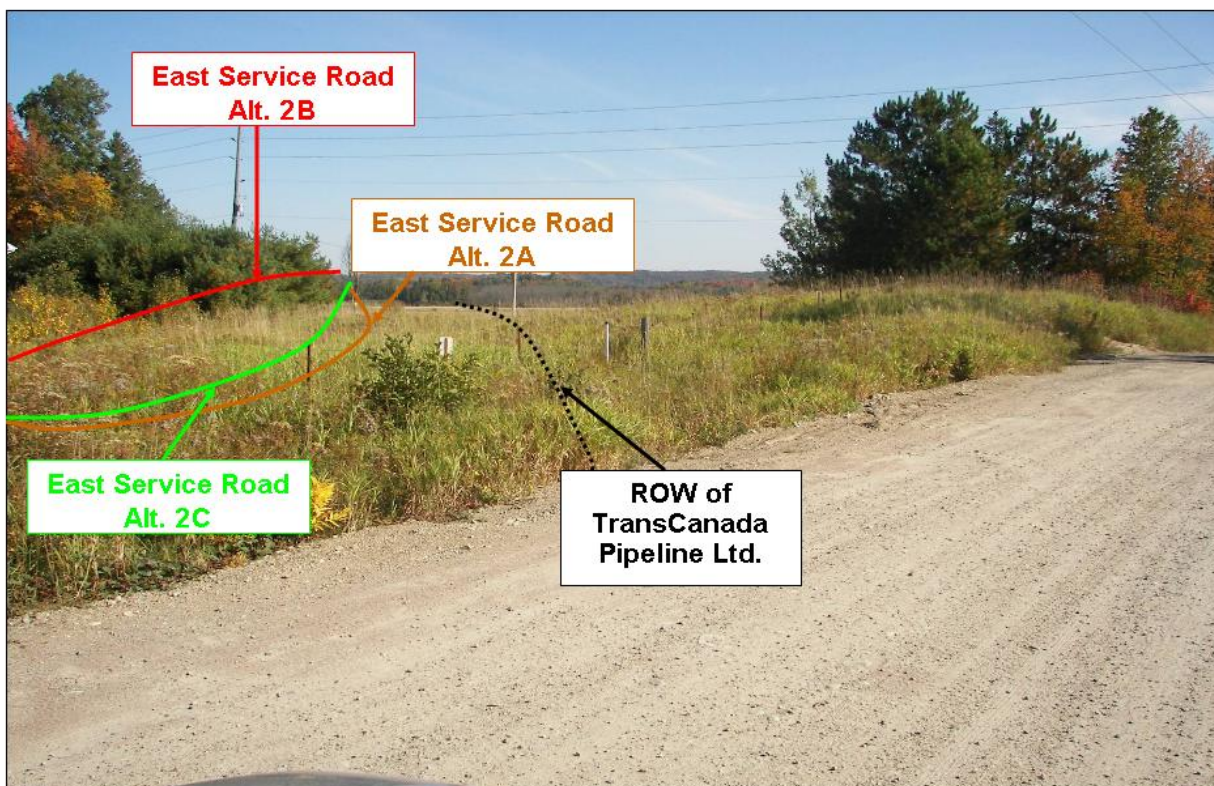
VIEW: Looking northeast from east shoulder of Rowanwood Road opposite No. 119 (Hoover/Robertson) across open field with bush and swamp area in distance. TransCanada Pipeline Easement in foreground at creek. (Nov. 2007)
